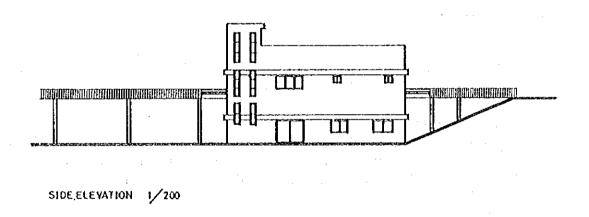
Conceptional Plan of Passenger Terminal Side Elevation
